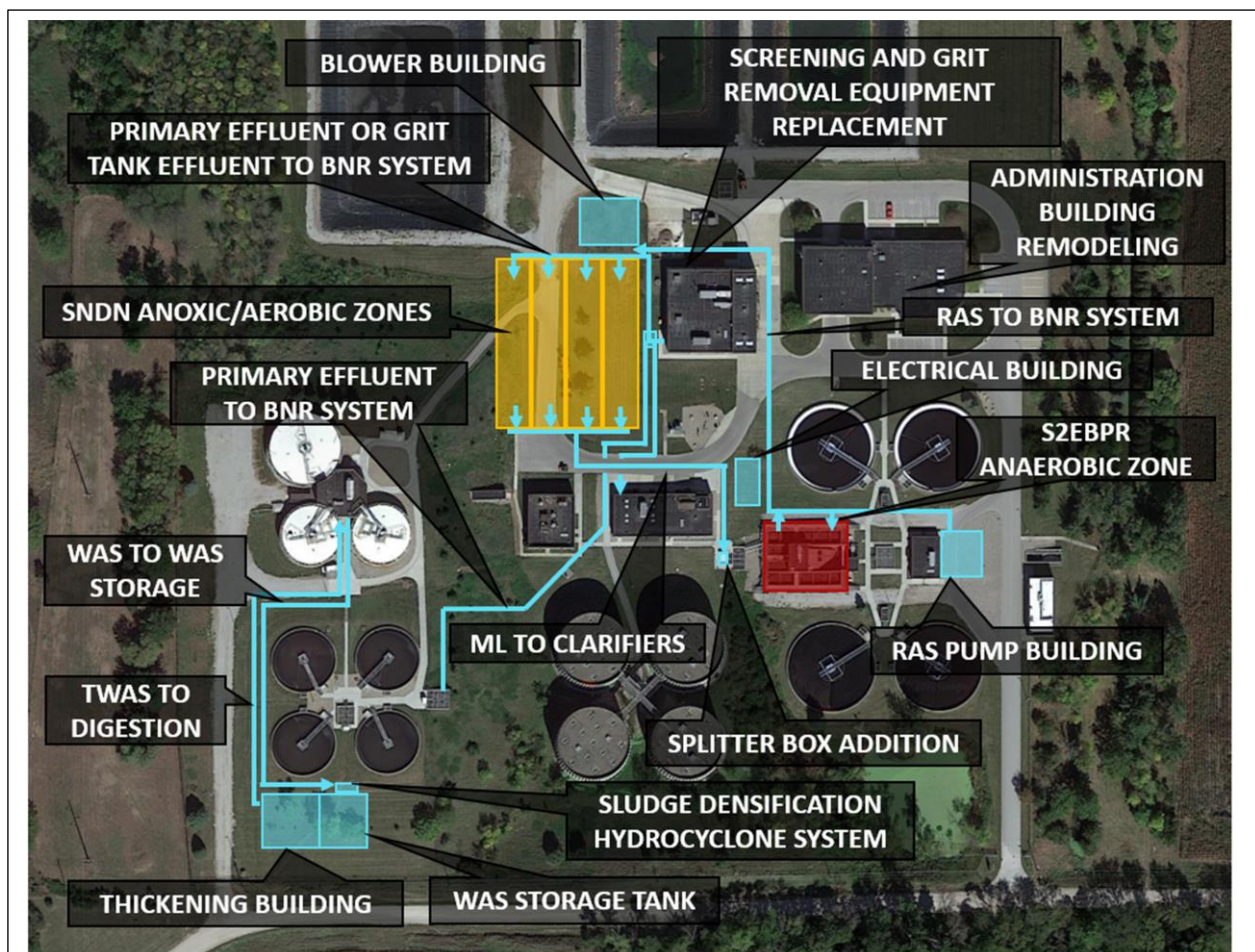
Siting Alternative 1 Preliminary Layout
